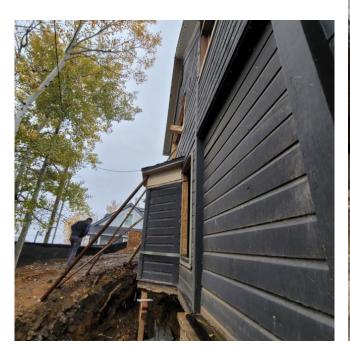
Applicant's photos showing structurally compromised west wall of the Historic 1907 addition at 218 Sandridge in October 2025.
